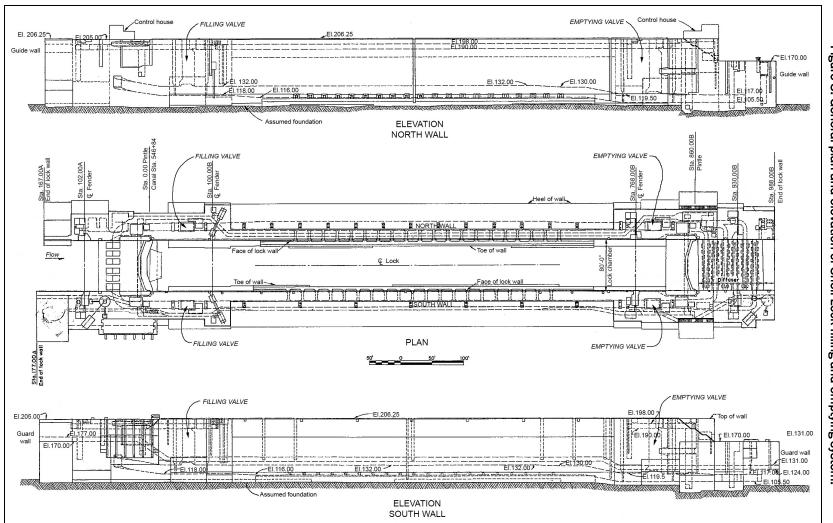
General plan and elevation of Snell Lock filling and emptying system.
